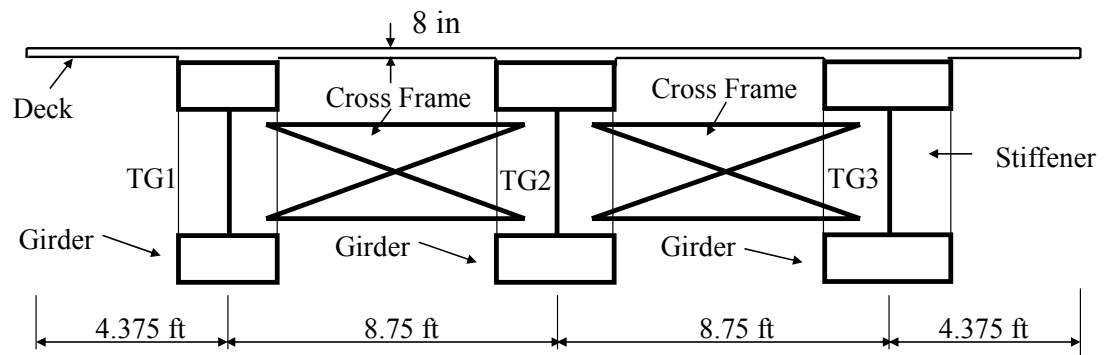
Three-Girder Bridge Cross Section Schematic
